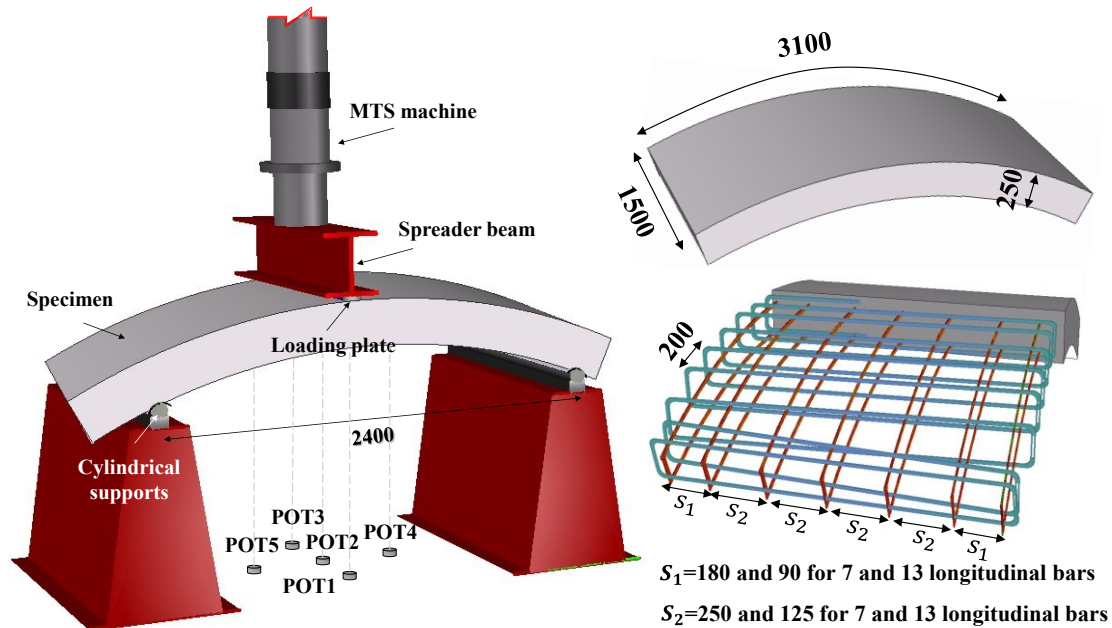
Specimens geometry, reinforcement details, test setup, and instrumentations, dimensions in mm (Note: 1 mm = 0.0394 in).
